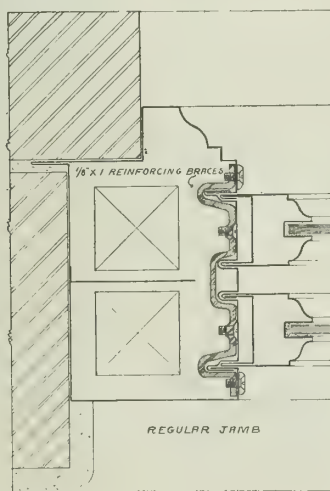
DETAIL OF POMEROY NO. 14 DOUBLE HUNG HEAVY PRESSED GALVANIZED STEEL WINDOW
